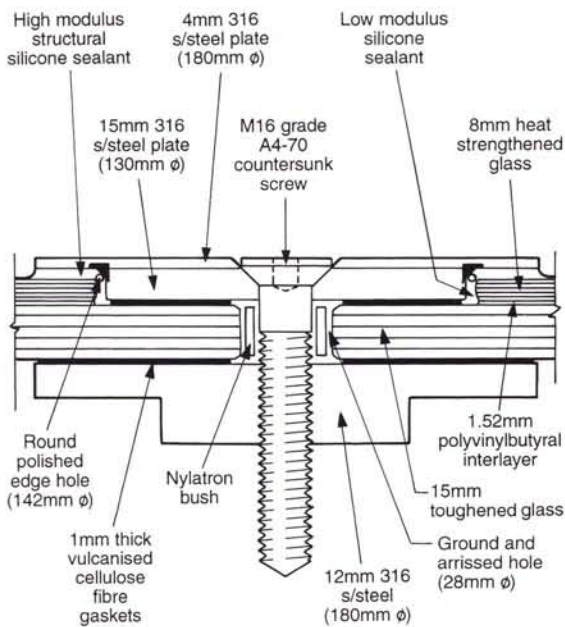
A Beyeler Art Gallery bolted connection (courtesy Ove Arup & Partners)
